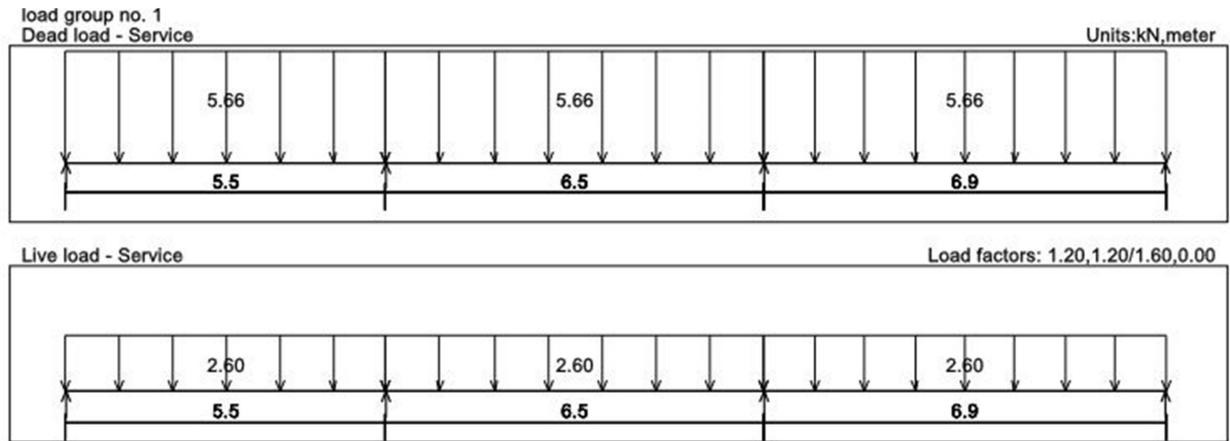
Statically System and Loads Distribution of Rib(R26).
